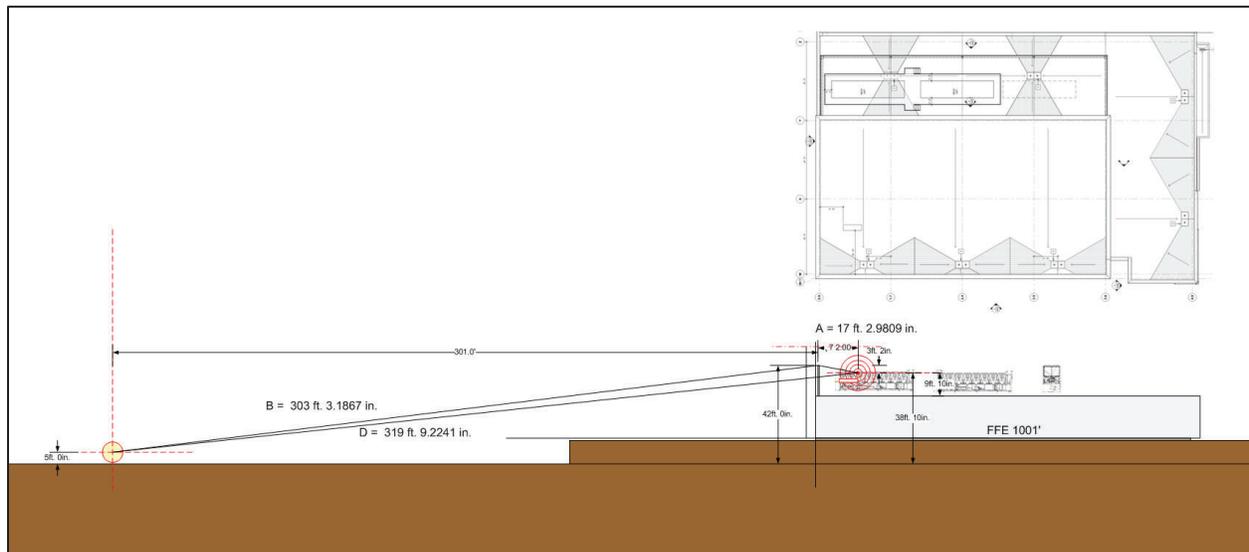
Sketch showing the chillers and barrier wall arrangement used to evaluate noise for the Building 14 addition.
